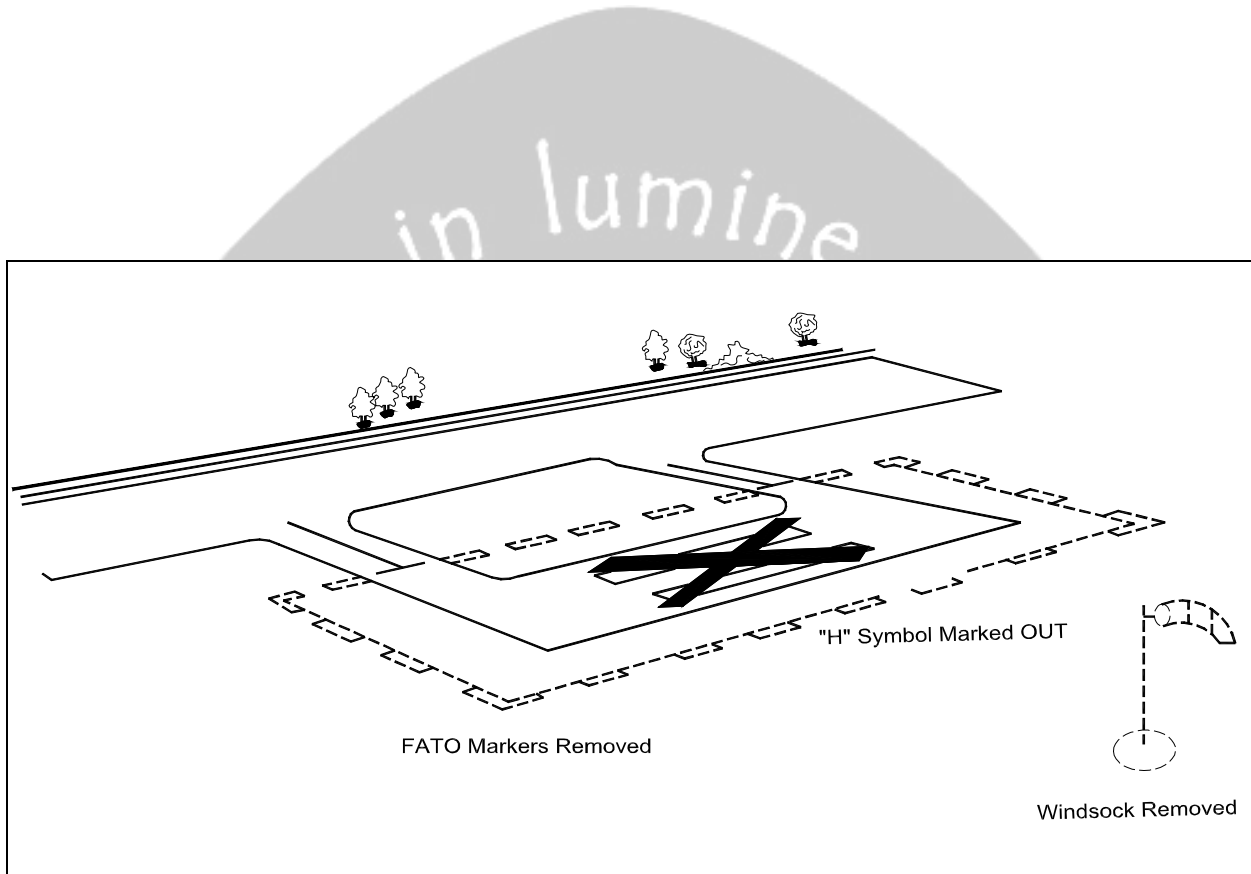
Paved TLOF/Paved FATO – Markings:
